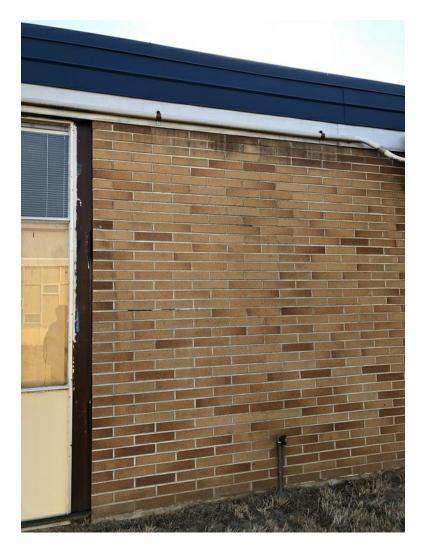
Exterior brick infill wall and exposed flange of steel WF column
